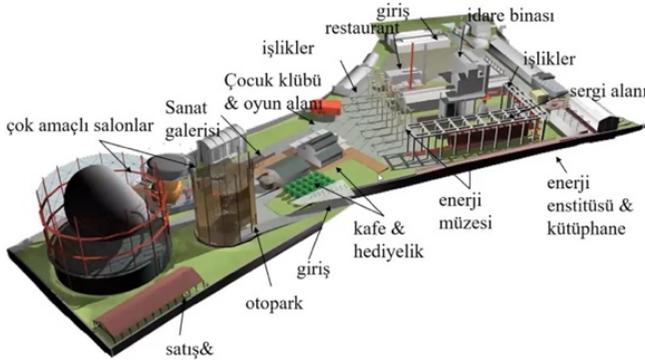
Hasanağa Gashouse site plan and function distribution (Architects Association 1927, 2021)
